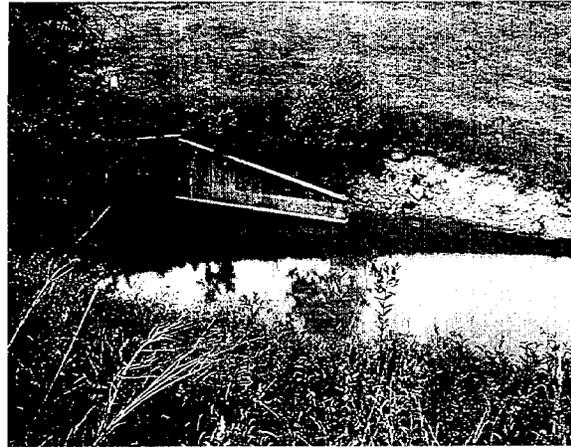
View from above Holts Creek shows severe erosion around wing wall.
